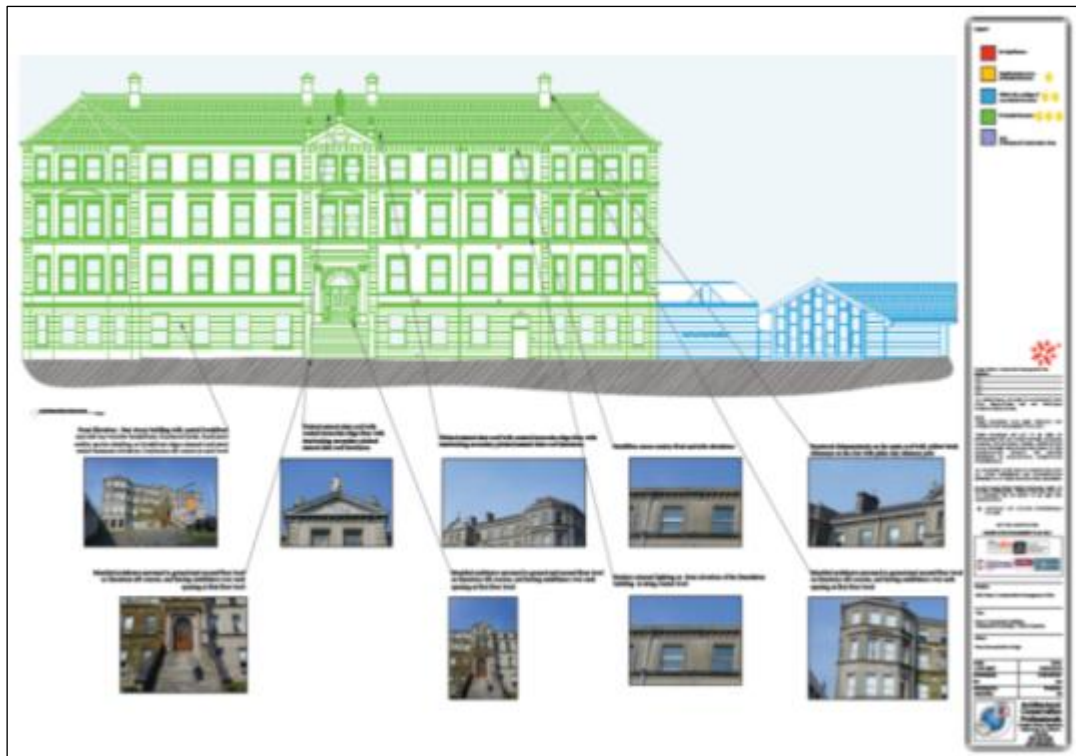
Foundation Building Assessment Drawing – Refer to Appendix B
